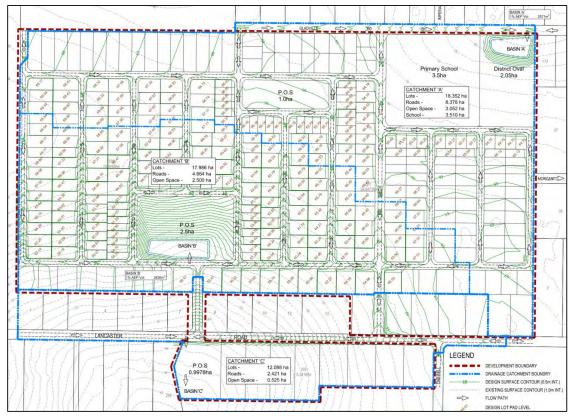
Stormwater Drainage Catchment Plan (TABEC)
